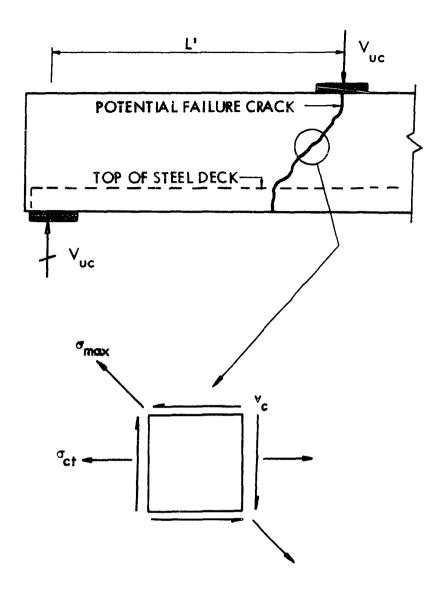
Forces at ultimate crack of typical shear-bond failure
